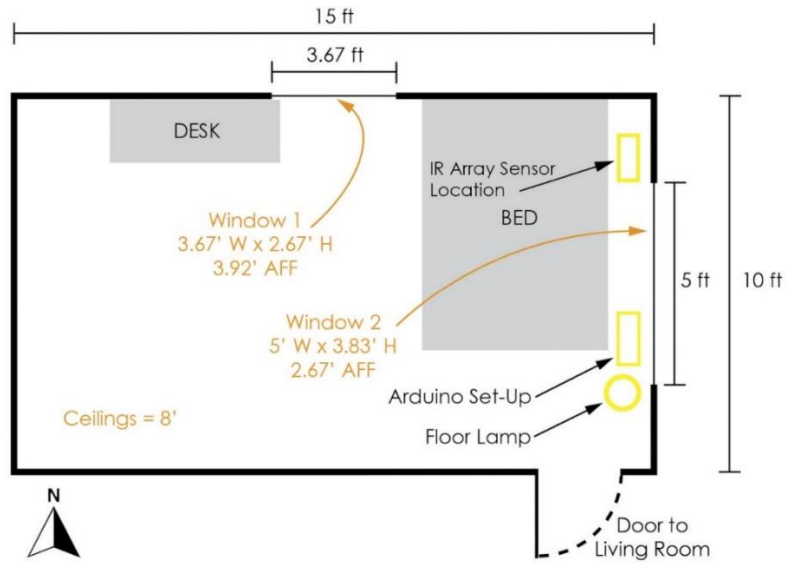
Floor Plan with Dimensions and Equipment Locations
